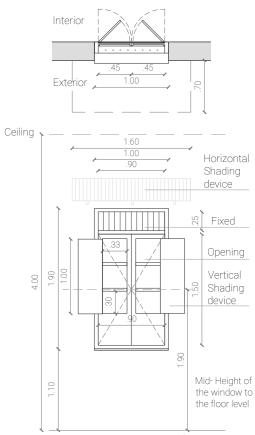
Window W2 plan and facade _Scale 1:50/Source: Author's elaboration
